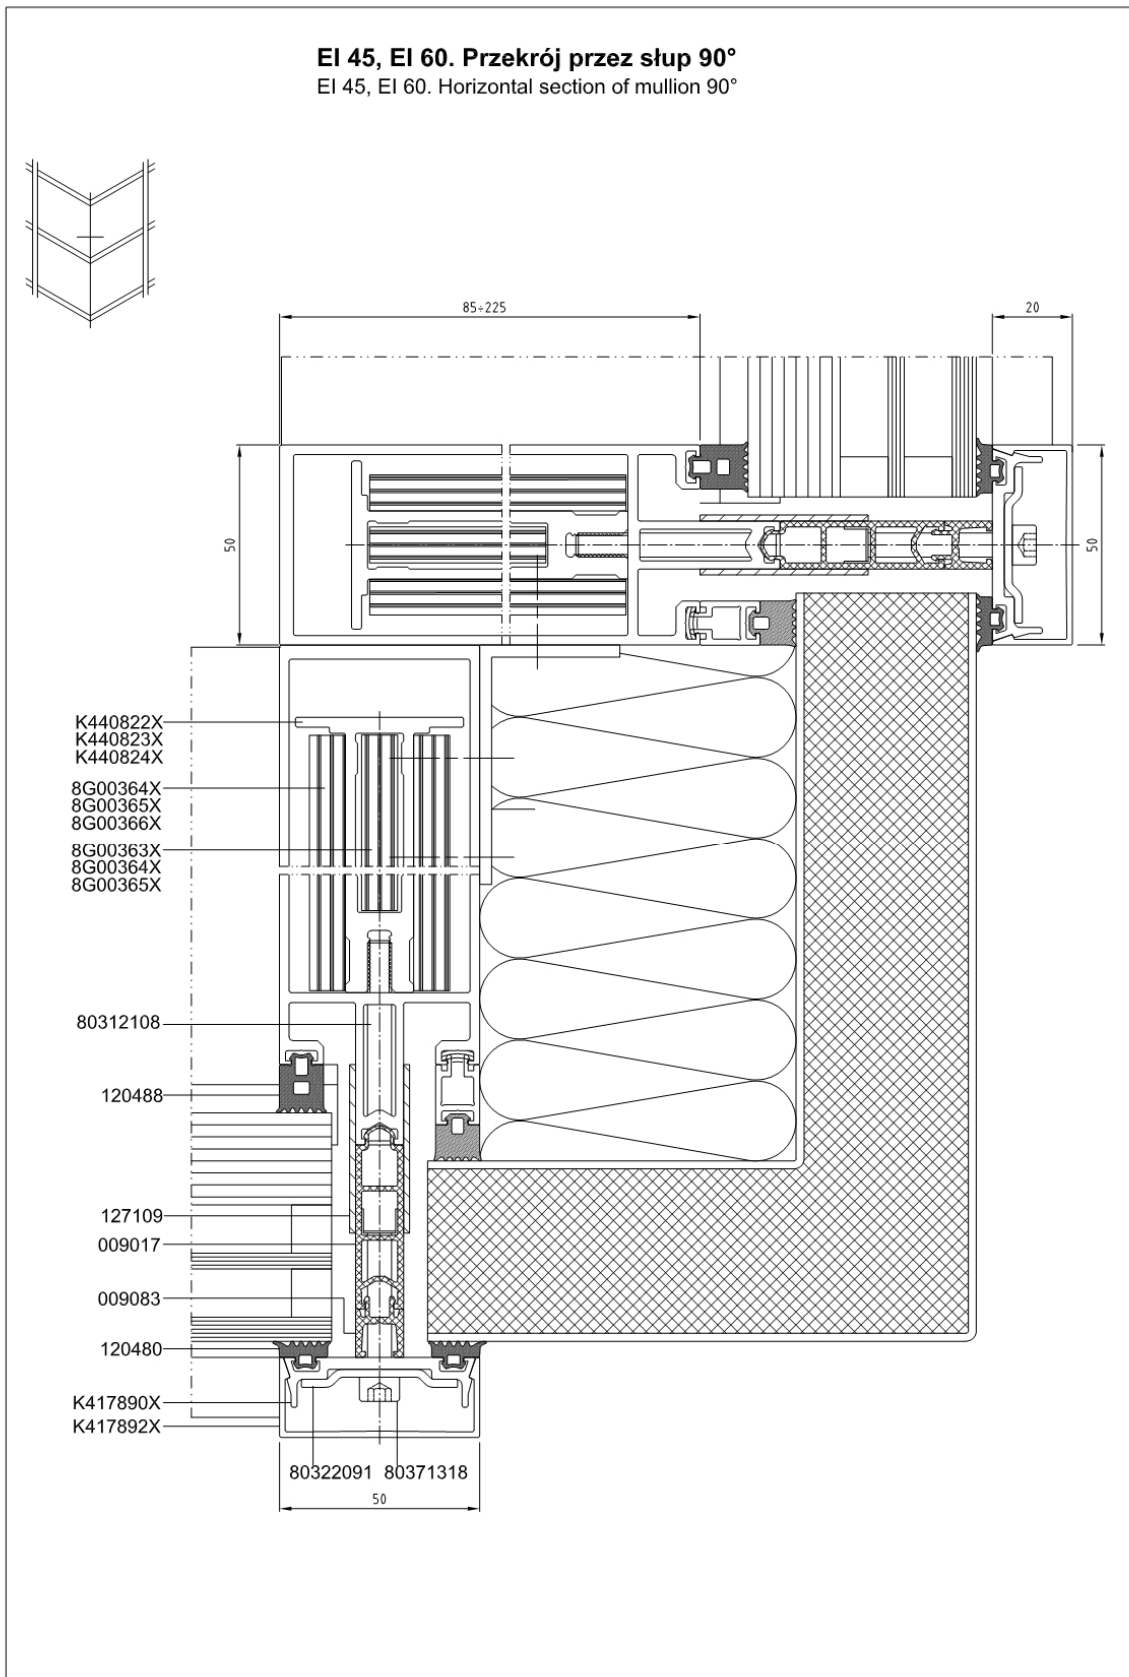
Typical cross-section through the corner of MB-SR50N EI EI60 system curtain wall
